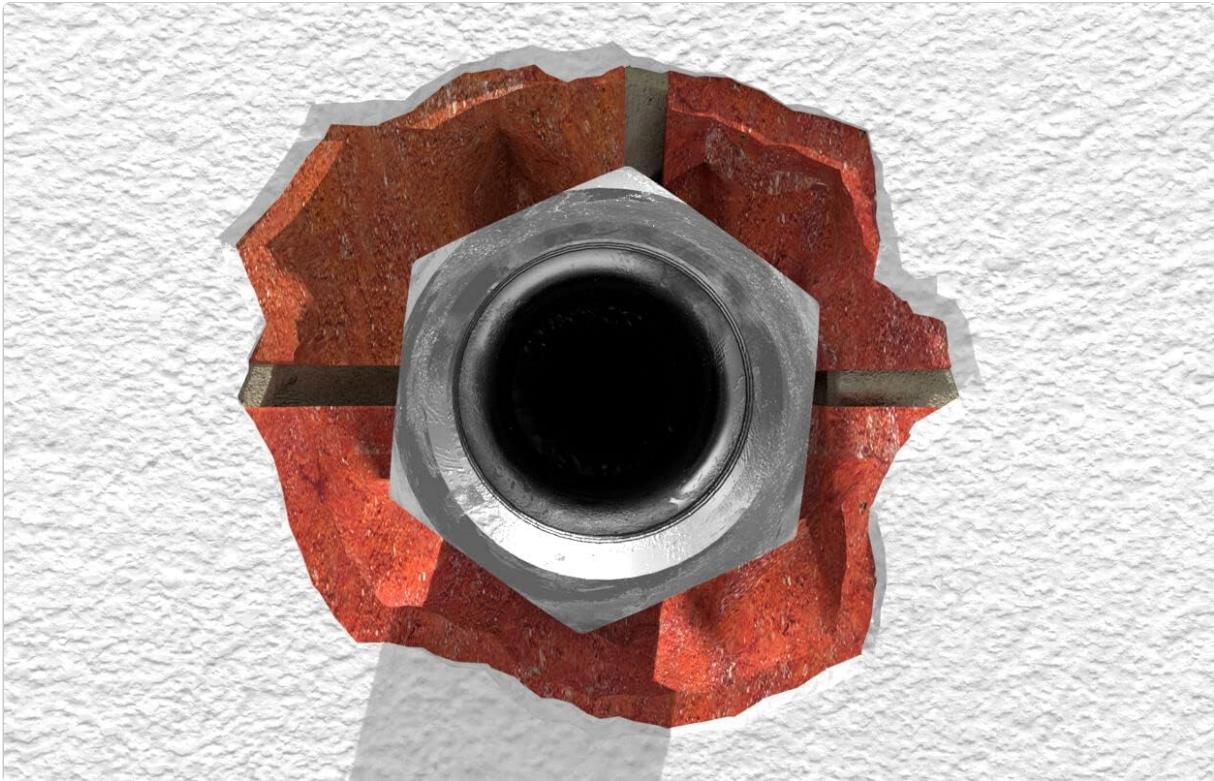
An example of a bolt secured in a wall, demonstrating how the mortar can be used for sealing and repair around fixings.
